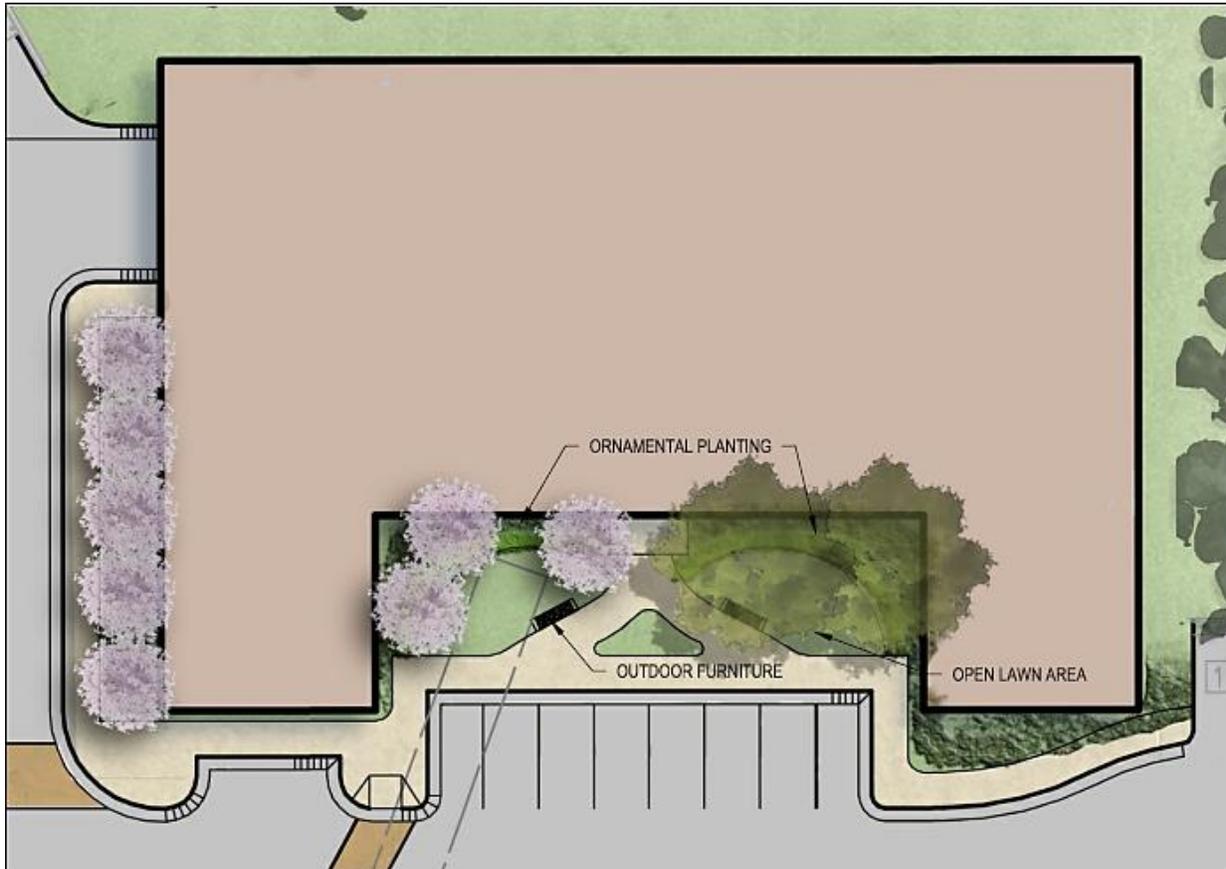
Condominium courtyard, Source: Sheet 33 of PRC Plan/SE Plat
